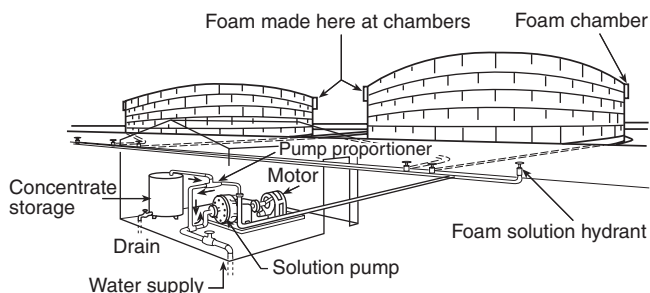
Schematic Arrangement of Air Foam Protection for Storage Tanks.
